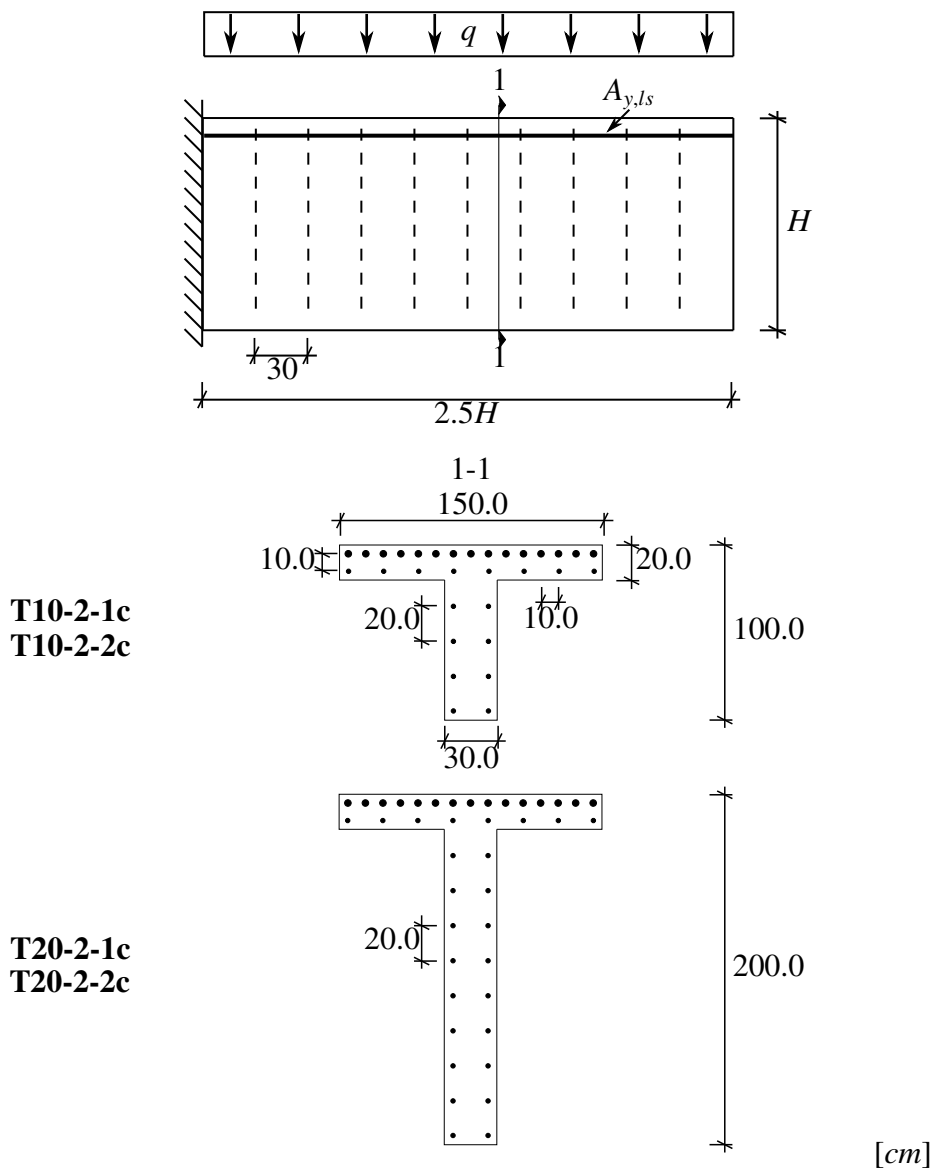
Setup of the numerical cantilever tests, equivalent to the one-sided clamped single span girders
